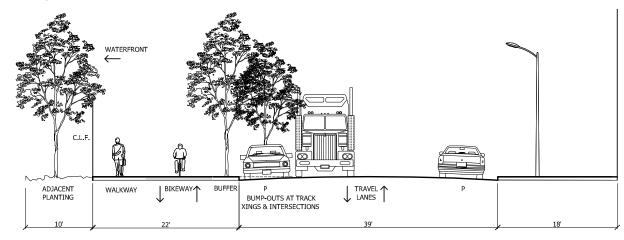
Possible Configuration for Second Avenue 27th Street to 39th Street
